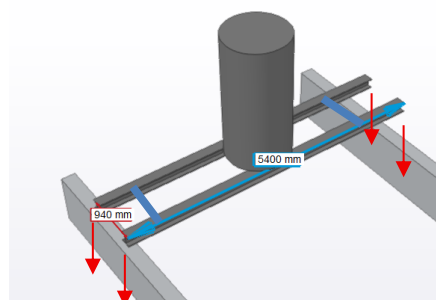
Plan and detailed view of the new cylindrical tank in Area 3 of the terrace.
